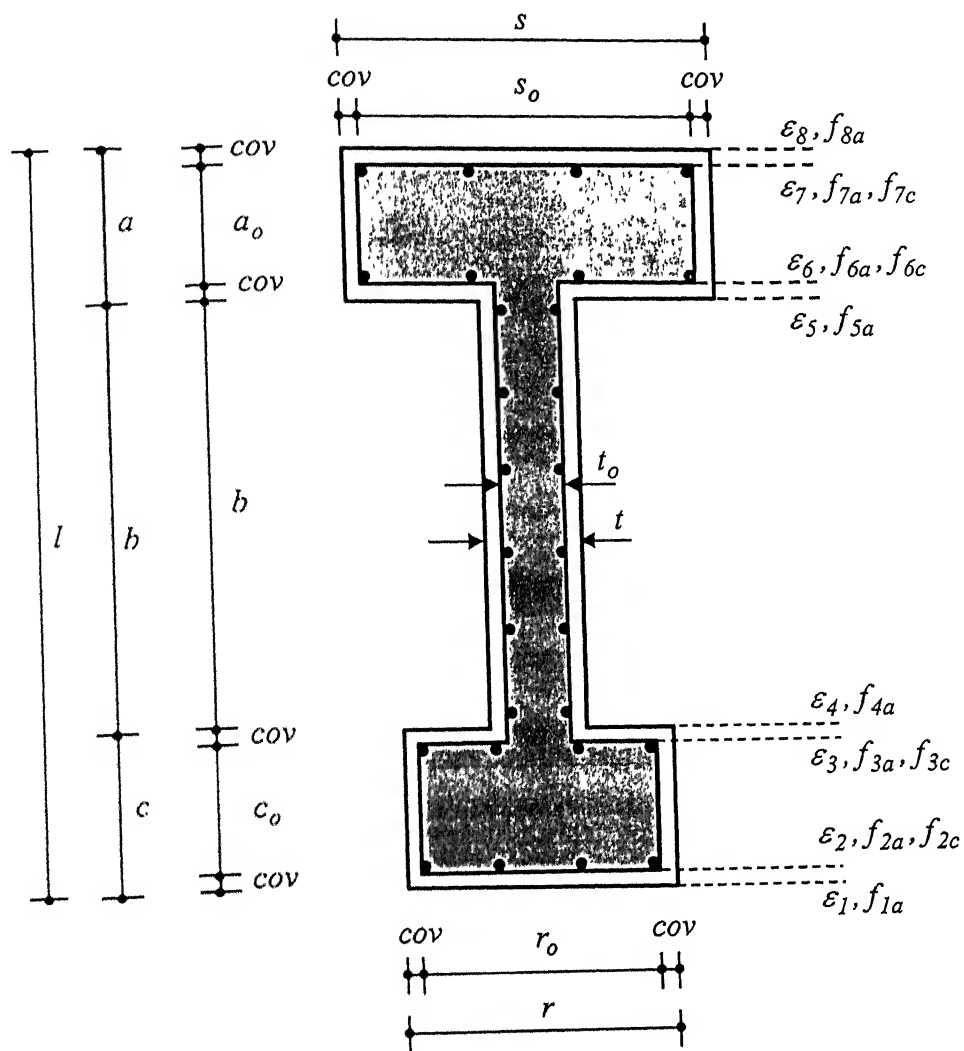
Dimensional and stress-strain notations for wall section with boundary elements
